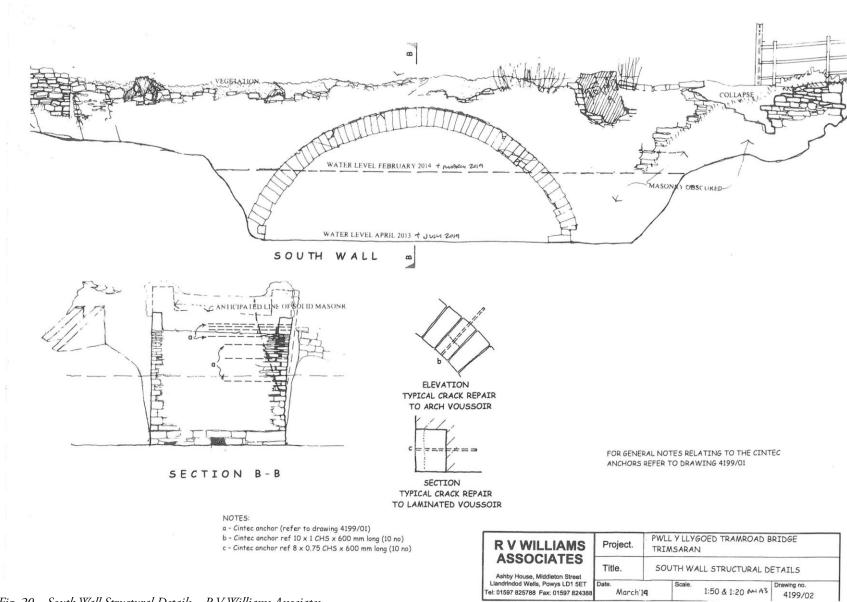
South Wall Structural Details – R V Williams Associates.
